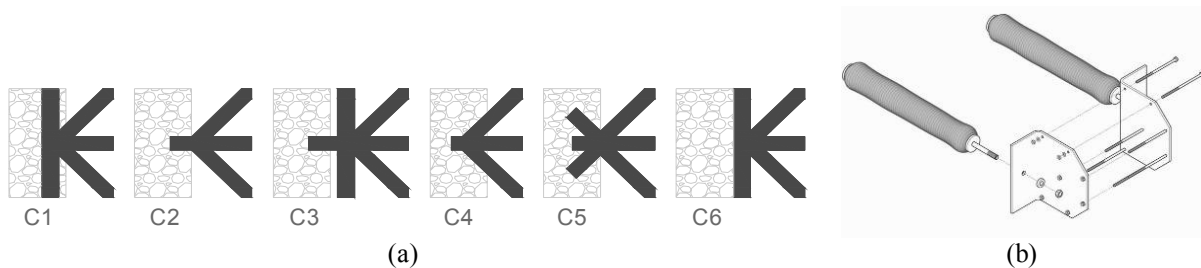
Different type of wall-to-half-timbered wall connections: a) six types of connections (adapted from [5]), b) adopted strengthening solution [6]
